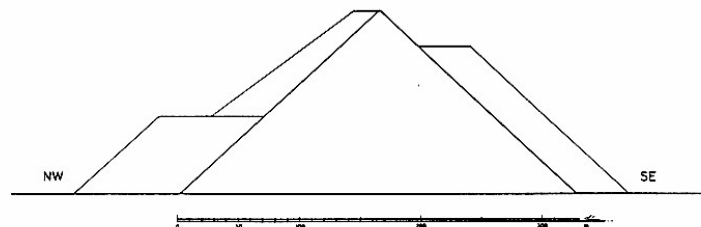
B. Pyramid and accretion construction ramp in cross-section on the NW-SE diagonal of the pyramid.
